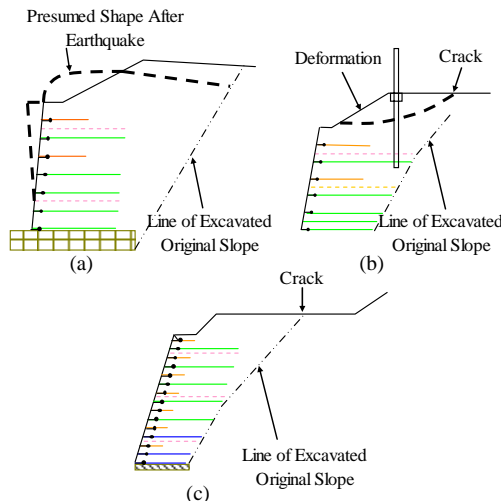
Simplified plans of geotextile reinforced soil retaining walls
